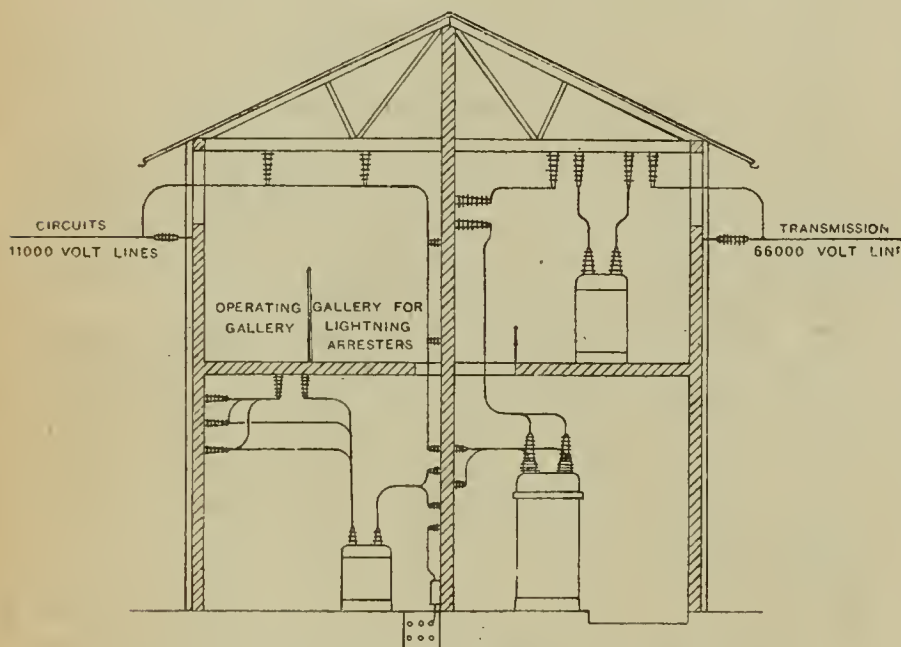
PROPOSED SUB-STATION ARRANGEMENT.
